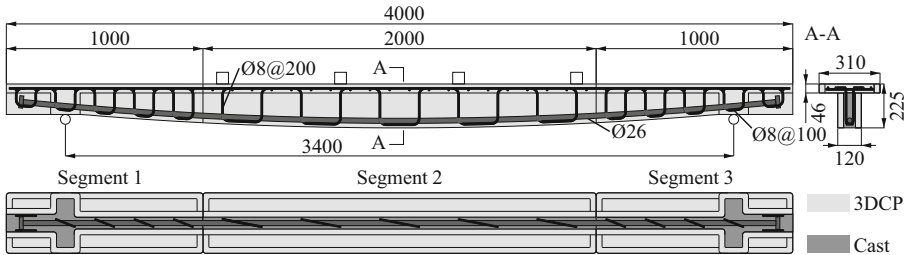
Overview of the geometry and reinforcement layout of the T-beam (dimensions in [mm]).
